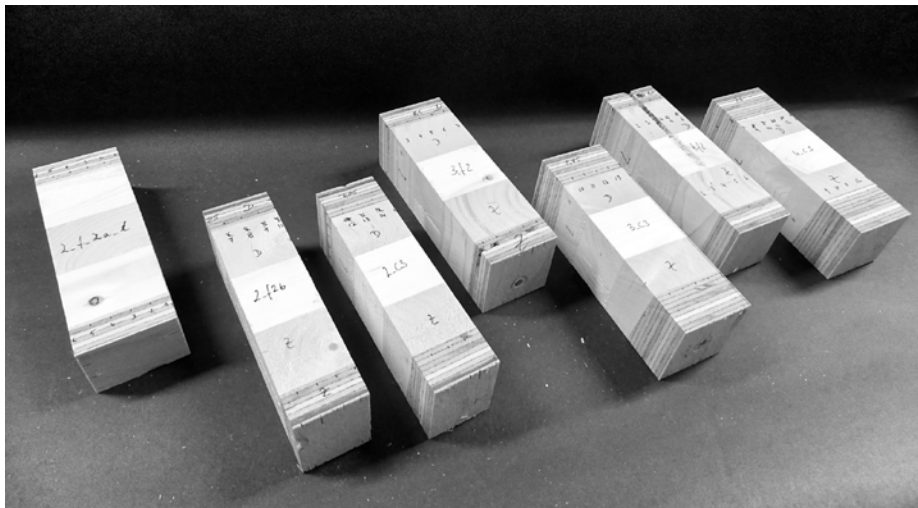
Shear block specimens for the testing of horizontal surfaces, cut from alternative B
